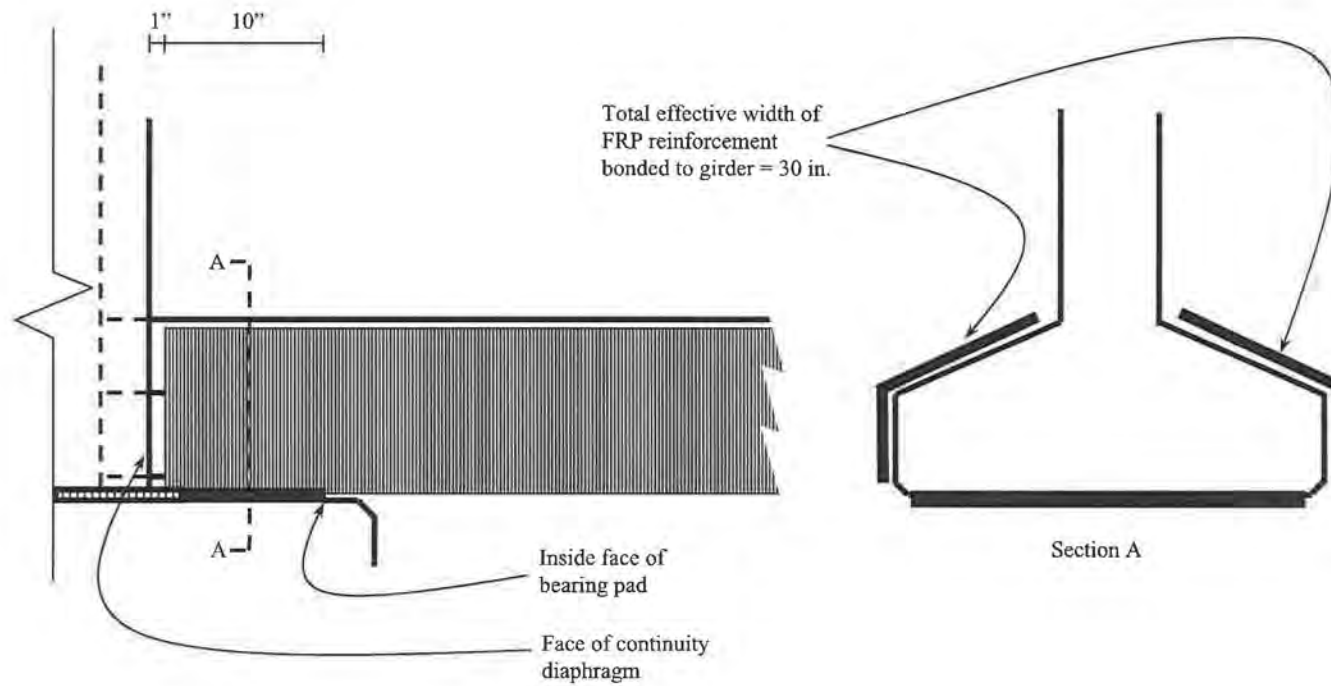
Detail of Cross-sectional FRP Configuration for Cross Sections Over and Behind the Bearing Pad at the Continuous Support
